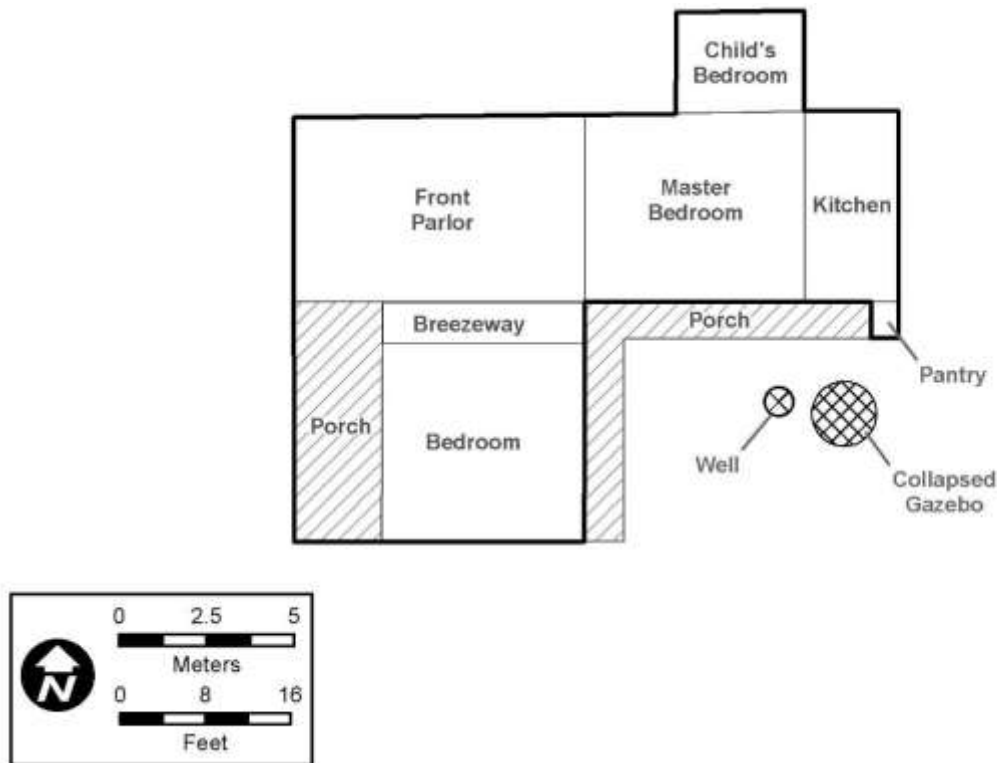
Resource 1A—Schematic Sketch Map of Main House Floorplan
